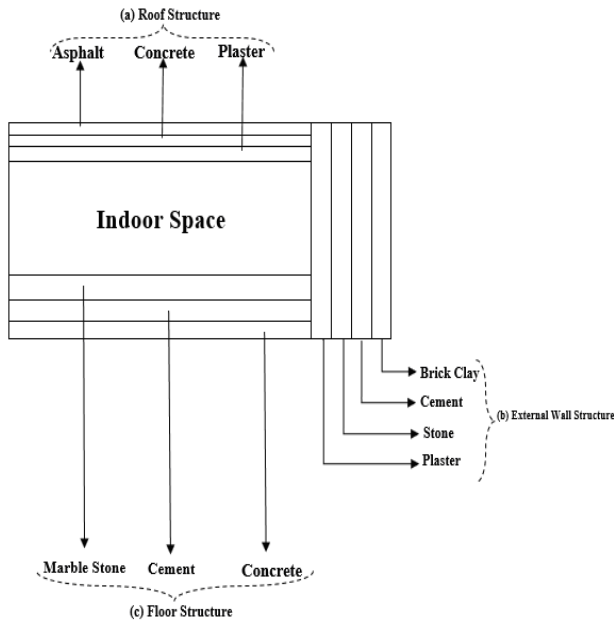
CMUAB roof, external walls, and floor structures layout: (a) Roof structure, (b) External wall structure, (c) Floor structure.
